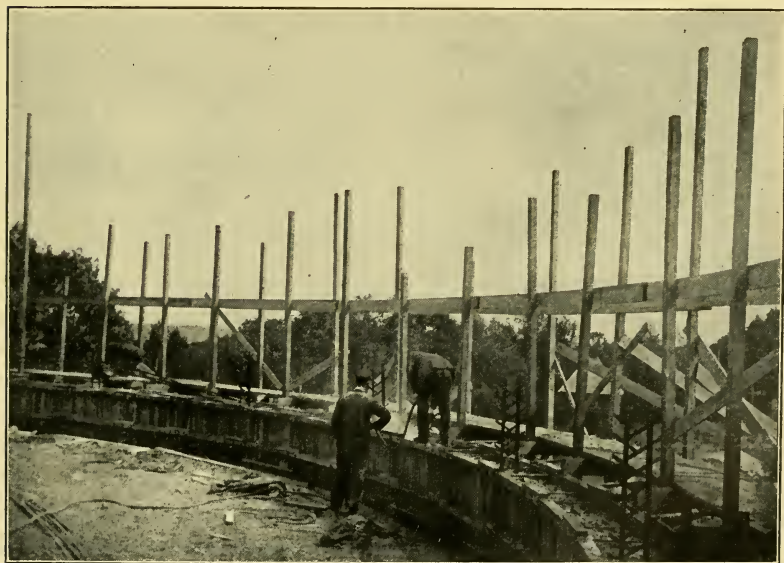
LOWER PART OF WALL, WITH SUPPORTS FOR REINFORCEMENT RINGS.
